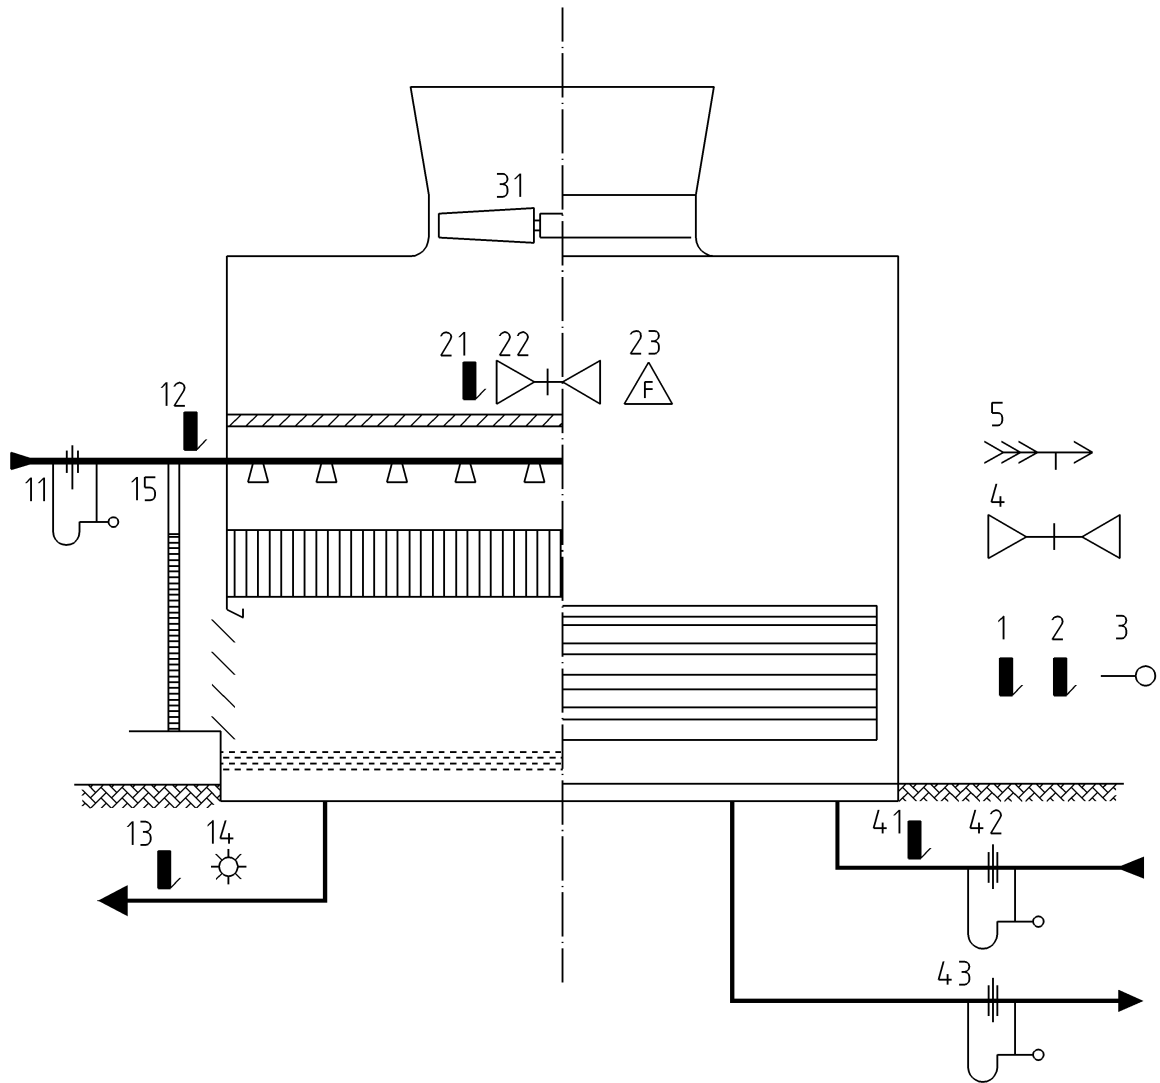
Measuring arrangement for mechanical draught cooling towers
